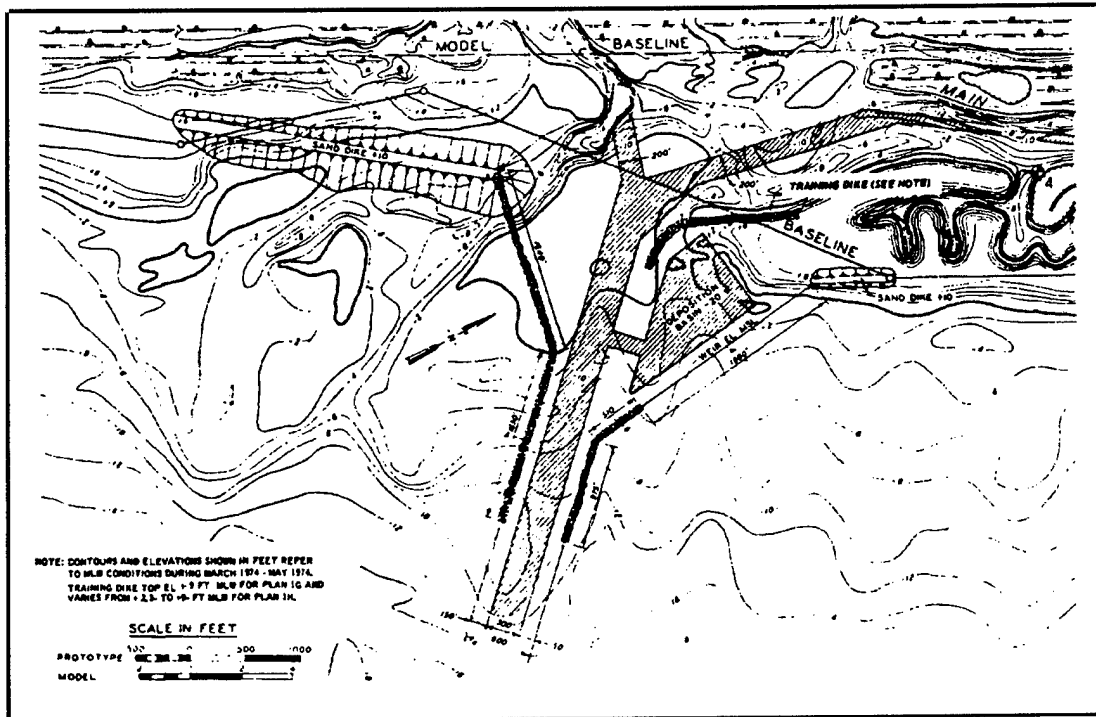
Optimum improvement plan, Murrells Inlet, South Carolina.
